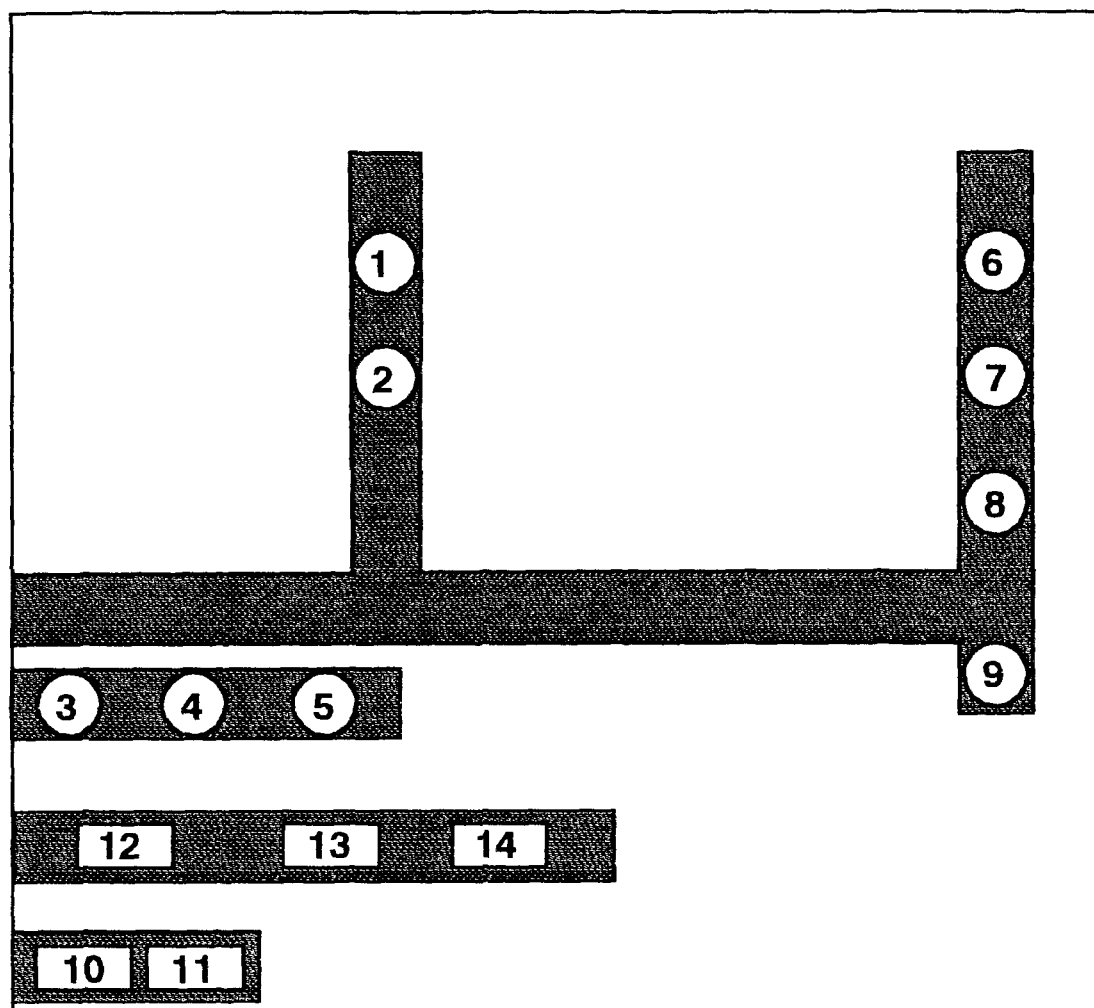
CONTROL AREA VENTILATION DUCTS (PLAN VIEW)
